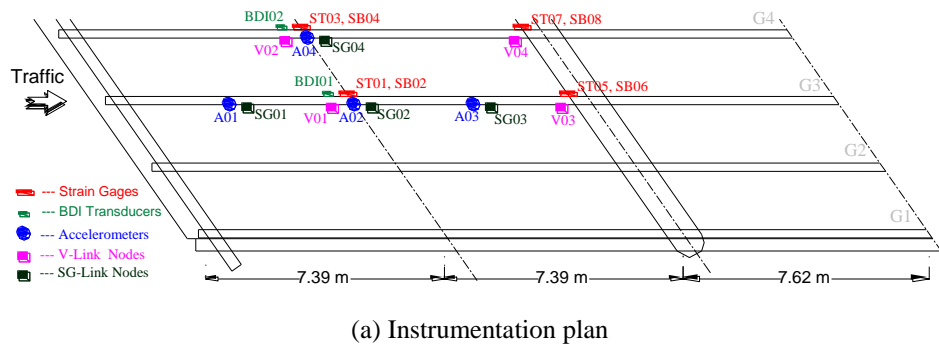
Layout of instrumentation on Evansville Bridge Superstructure for Load Testing
